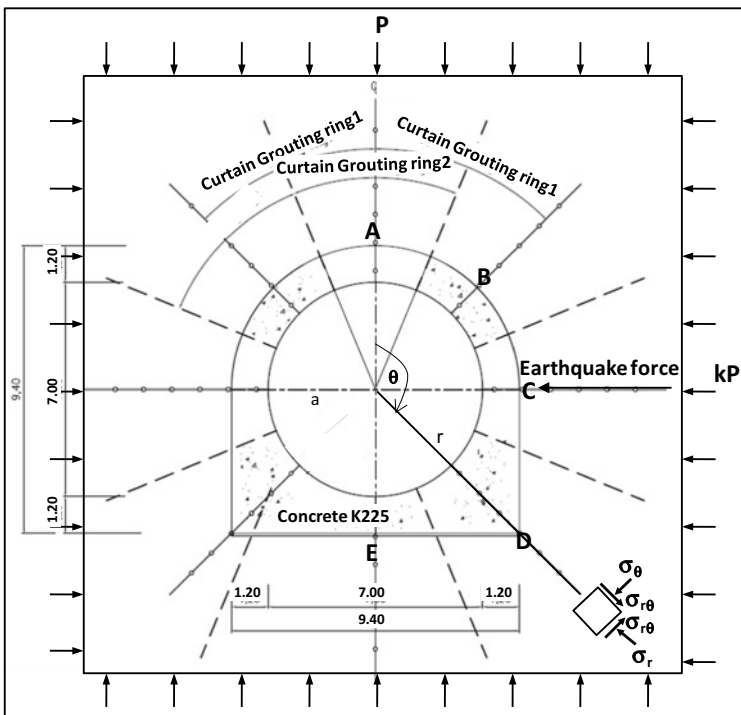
Typical type 2 of diversion tunnel with stresses working around tunnel: Crown A, Crown B, Wall C, Base D and Base E are parts of tunnel being analyzed. Earthquake forces are horizontally working perpendicular to the tunnel axis, where a is radius and r is a point distance of estimations [8]
